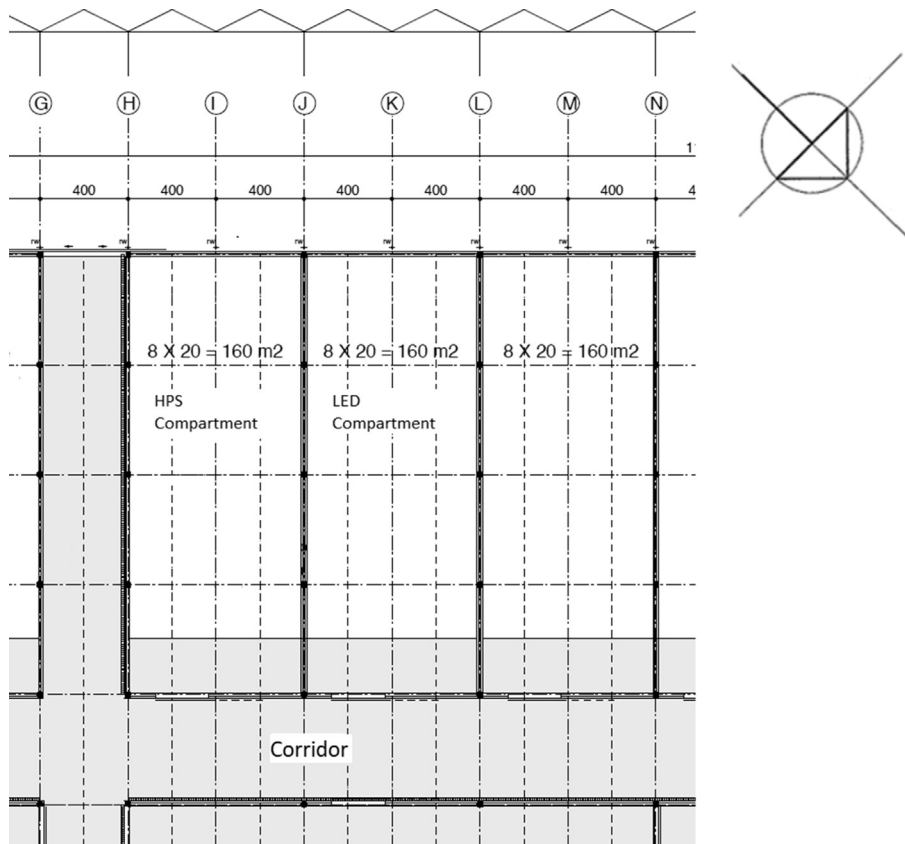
Cross section of the greenhouse. The grey colour indicates a concrete floor, while the white colour indicates a floor of ground covered with plastic sheeting.
